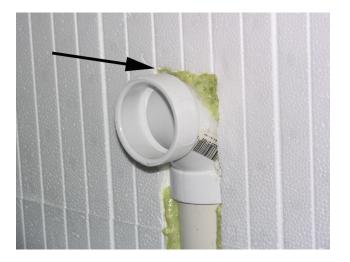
2" PVC pipe chased into an ICF wall.
